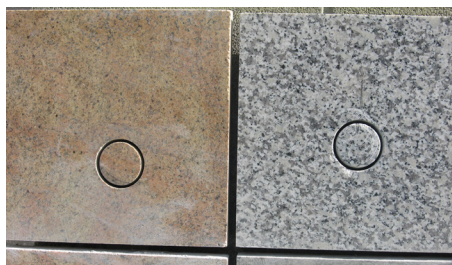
Stone cladding is core drilled in preparation for the tensile pull test.
